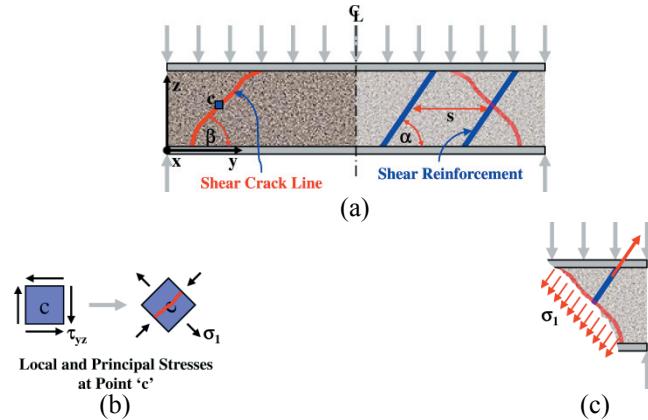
(a) An SCS sandwich beam with and without transverse shear reinforcement, (b) principle stress at diagonal crack section, and (c) free-body diagram of beam with transverse shear reinforcement at diagonal crack section
